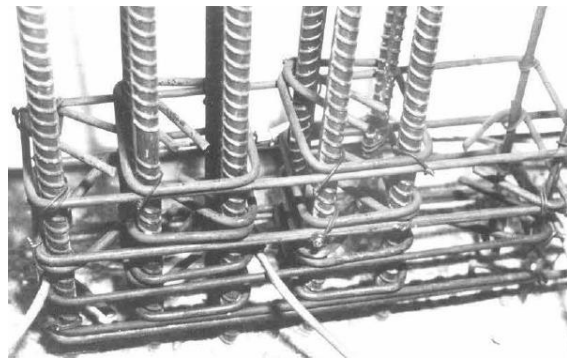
Paulay & Goodsir (1985) overlapping hoop detail
